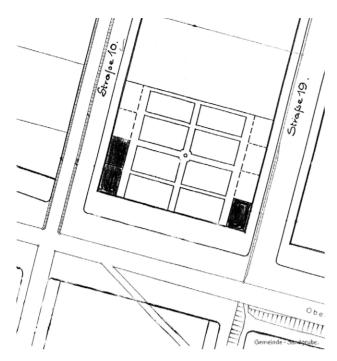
Wrocław, the building of the J. Gotthelf Foundation, location plan. 1912
